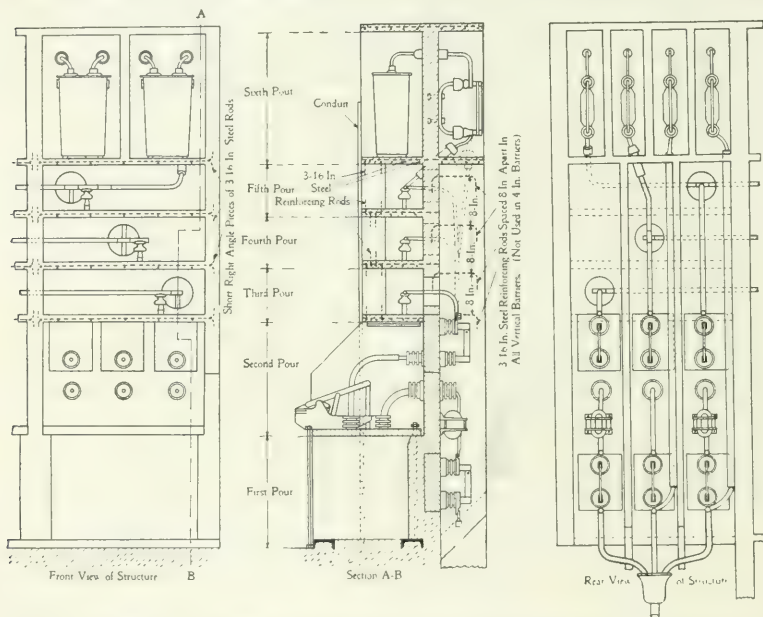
FRONT AND REAR ELEVATION AND CROSS-SECTION OF PORTION OF SWITCHBOARD STRUCTURE SHOWING STEPS IN POURING
